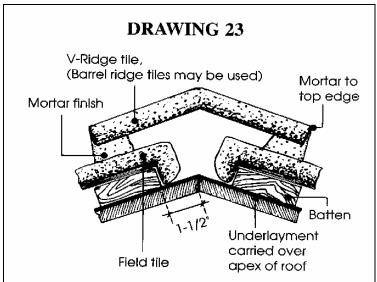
Ridge/Hip Tile Installation Instructions (Courtesy of the FRSA roof tile installation manual [18]).
